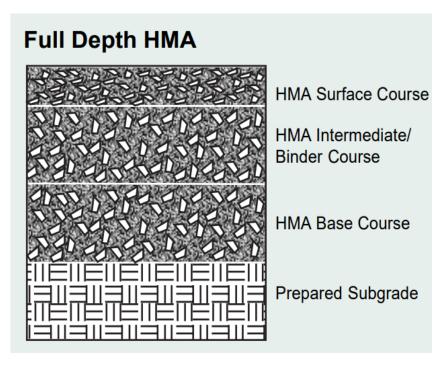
Typical design of a road structure as per FHWA HMA Pavement Mix Type Selection Guide
